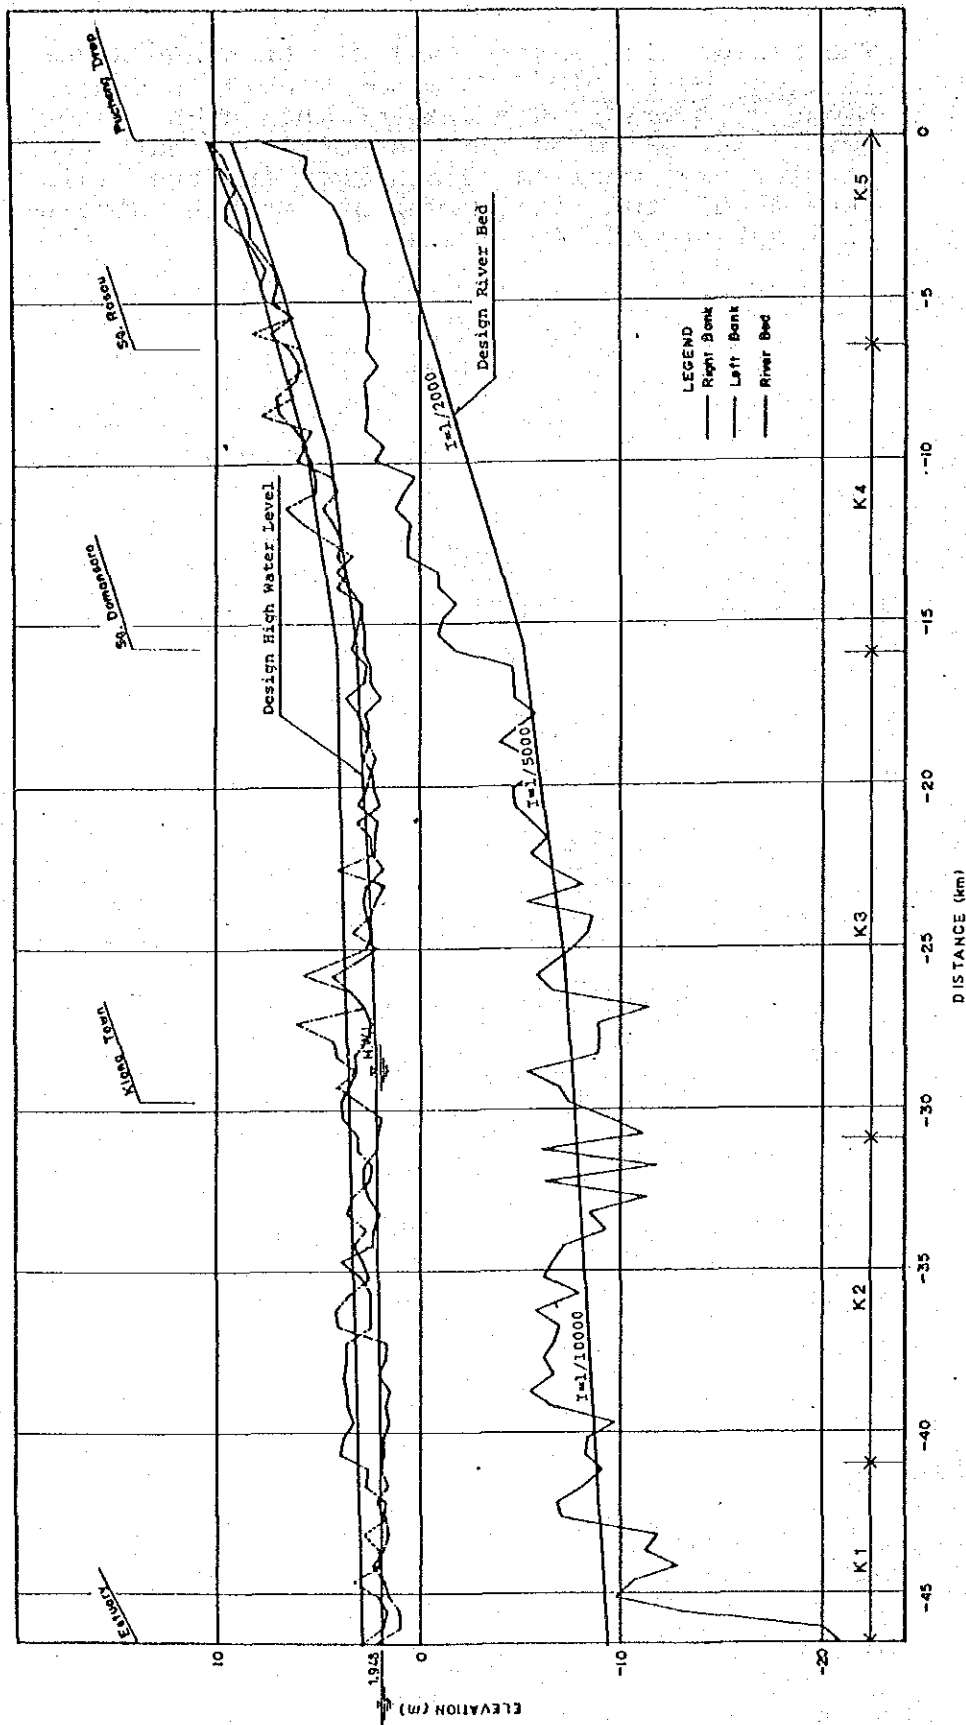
PLANNED LONGITUDINAL PROFILE OF SG. KLANG 1
